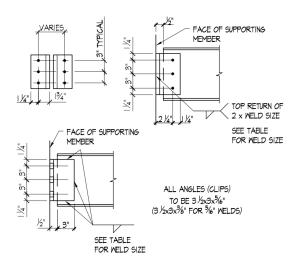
Typical Framed Beam Connections Detail, 1/S2.01
